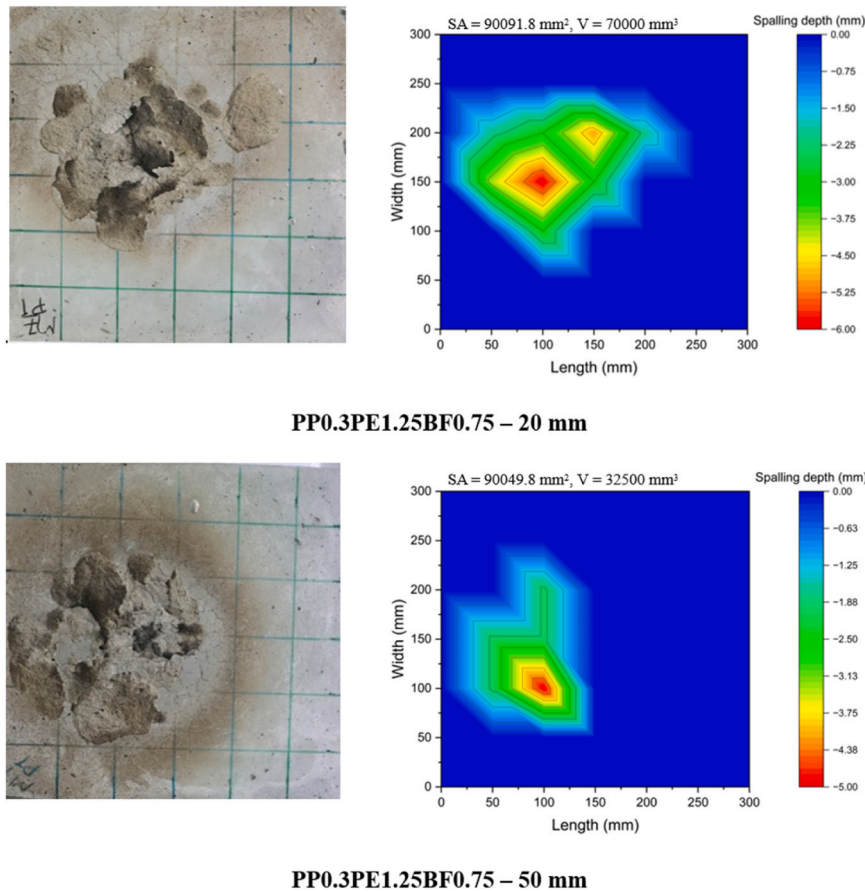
Picture (left) and surface profile (right) of mix PP0.3PE1.25BF0.75 – 300 × 300 mm panel specimens after 1-D blowtorch test.
